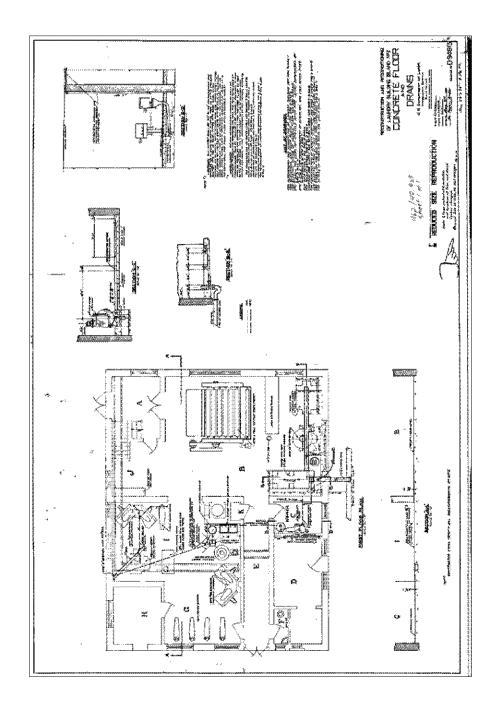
"Laundry Building Island No. 2 Concrete Floor and Drains," (10 June 1930) (NPS Drawing No. 462/42,959, Sheet 1 of 1) Source: Technical Information Center, Denver Service Center, National Park Service
